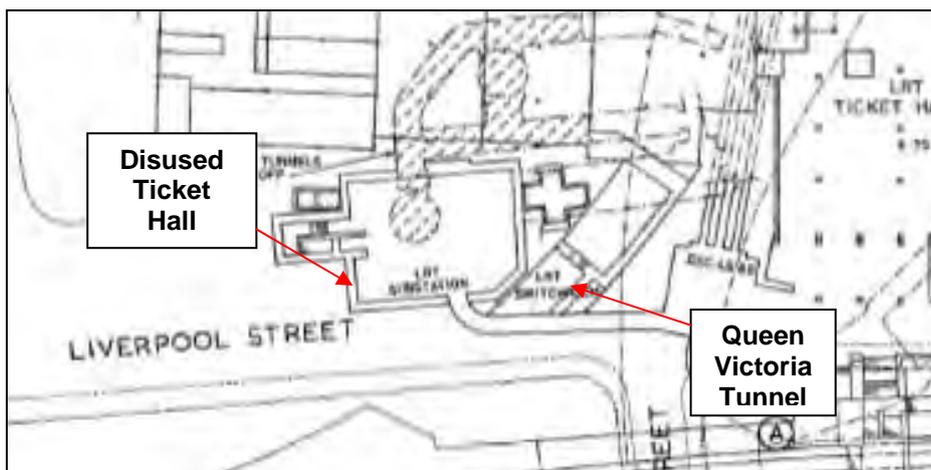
Archive drawing showing locations of disused ticket hall and Queen Victoria Tunnel at the Broadgate Ticket Hall sub-site
